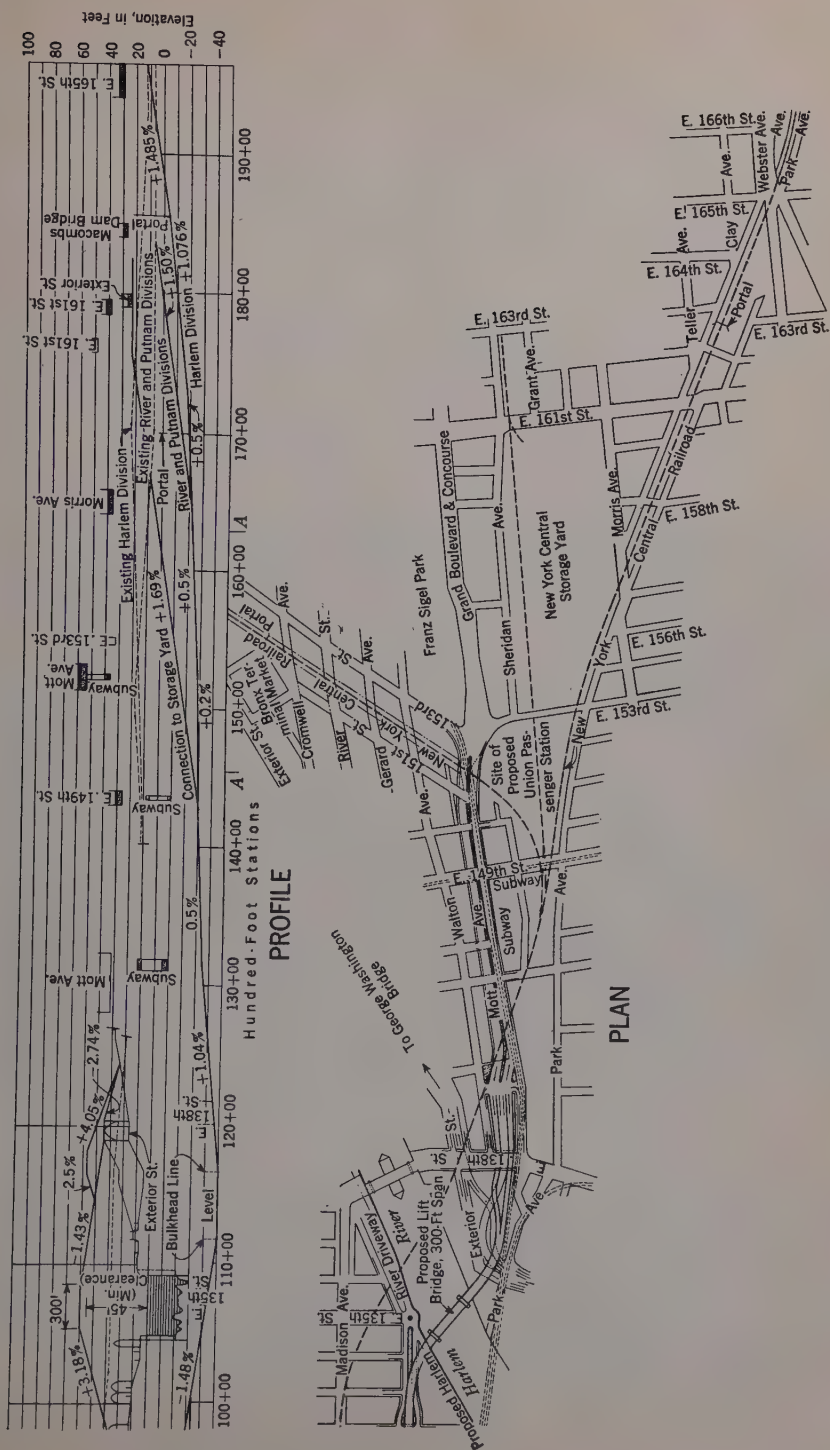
STUDY FOR IMPROVEMENT OF PARK AVENUE, NEW YORK, N Y
